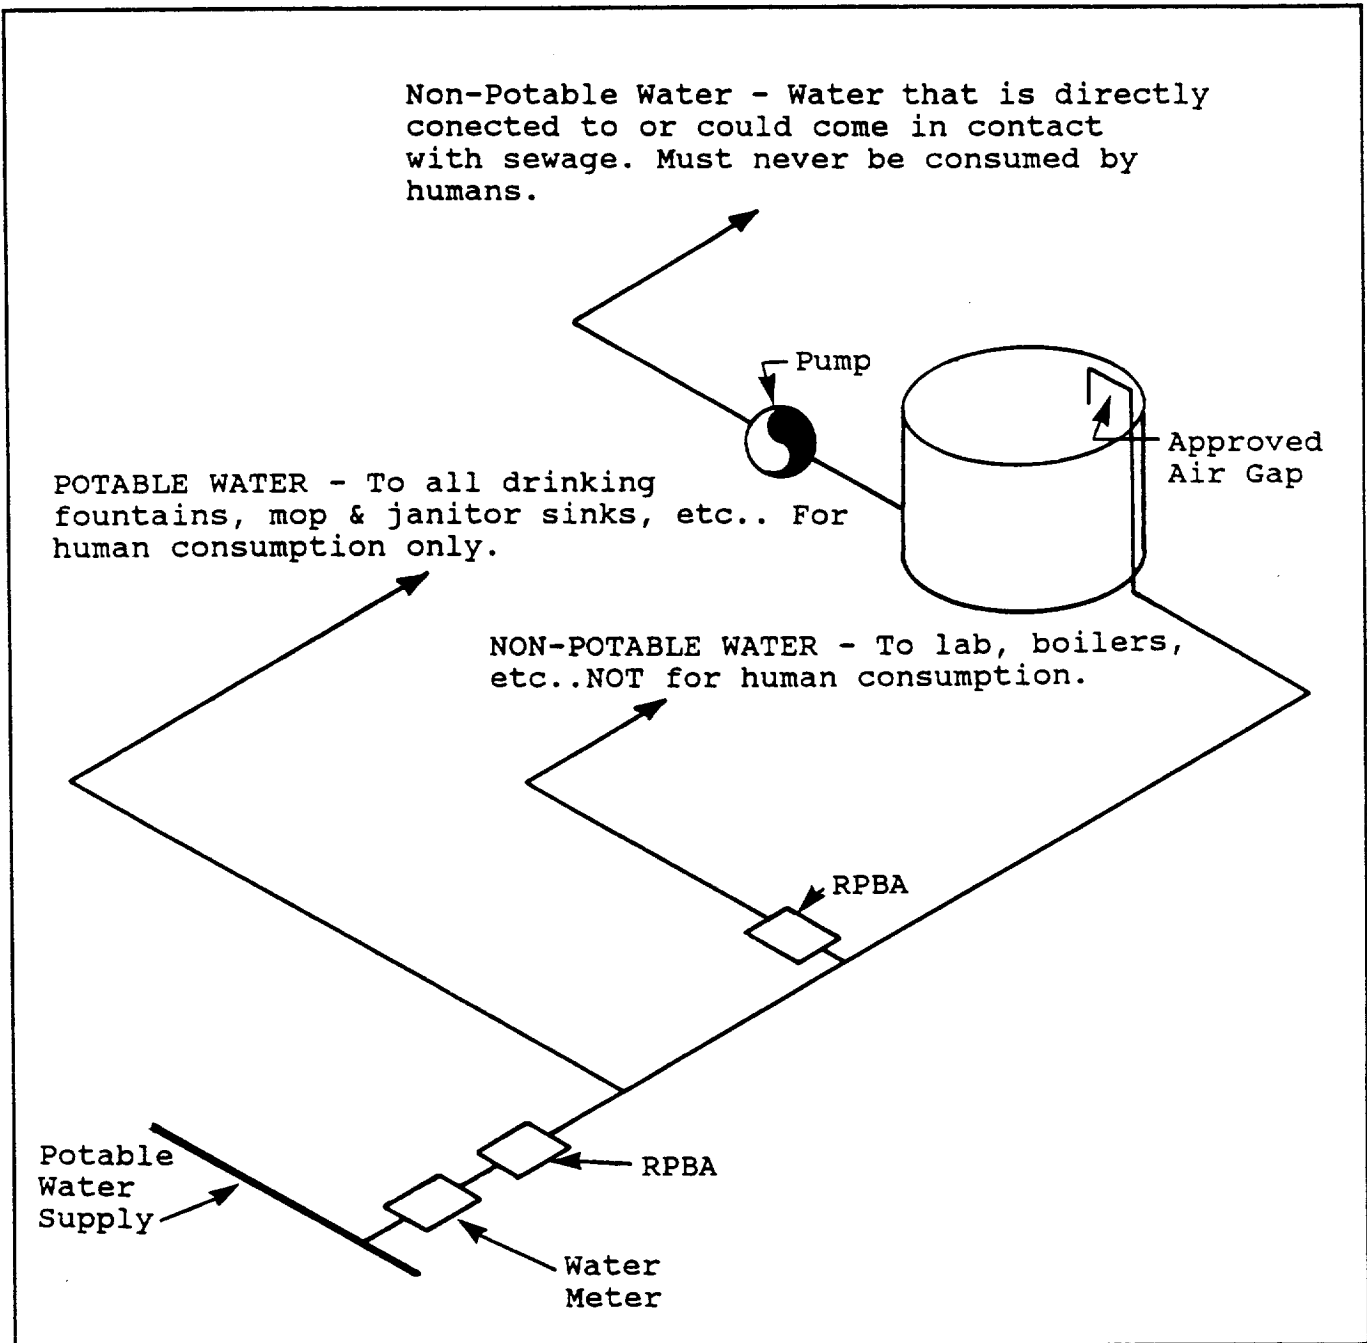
Example Of Backflow Protection For Wastewater Treatment Plant.
